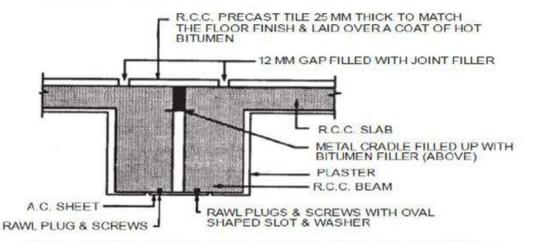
Typical Details of Expansion Joint at Floor
